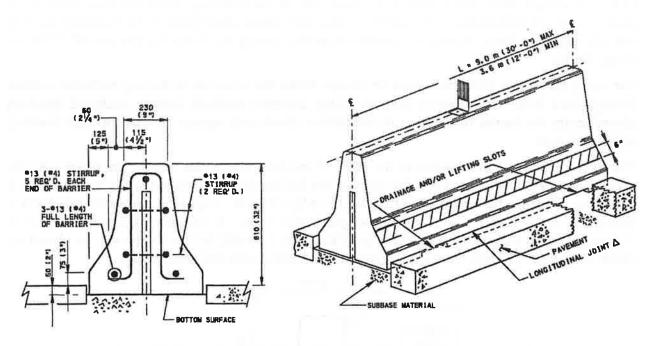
Pennsylvania's "keyed" anchoring system using pavement Source: PA DOT RC-57M sheet 1
